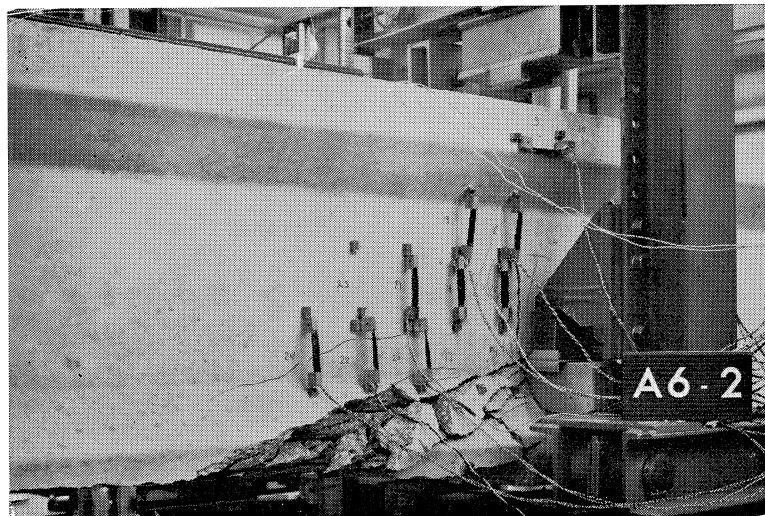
Beam without suspension reinforcement. The bottom flange has been pulled off the beam by the prestressed corbel.
